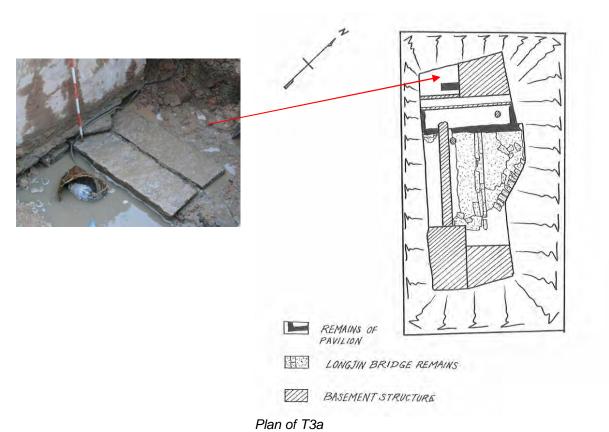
Two Granite Slabs of Pavilion for Greeting Officials
